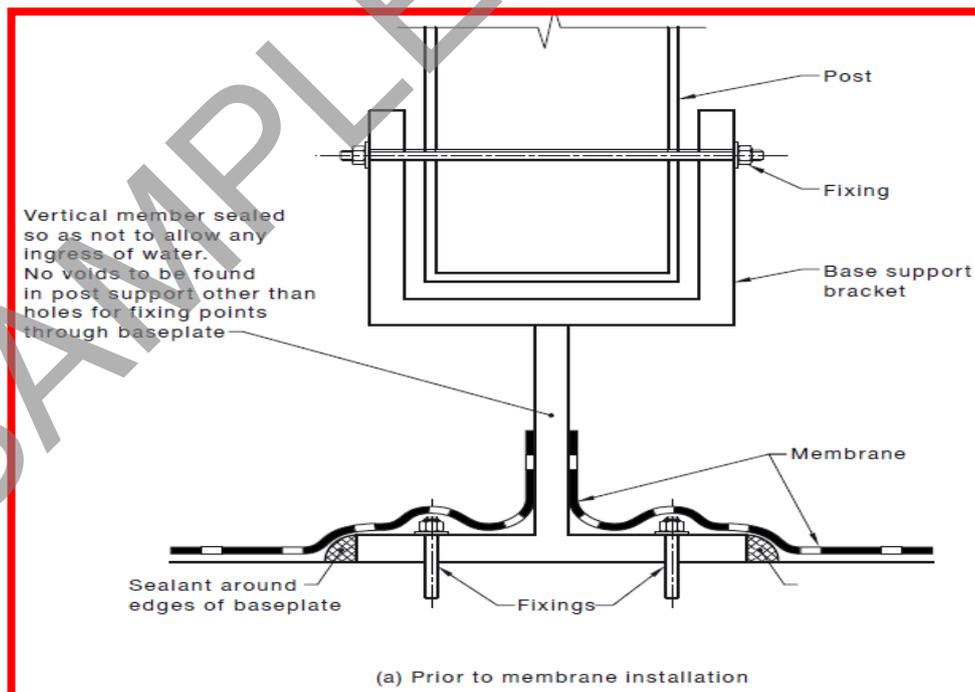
Figure 2.12 (in part) - Typical Details Of Metal Post Support.
